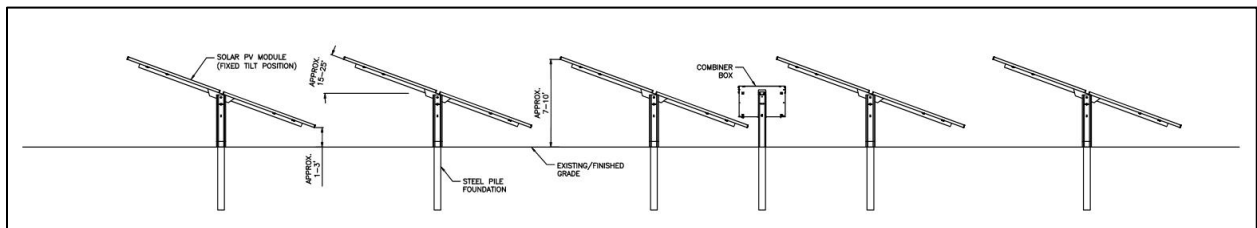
Horizontal Fixed-Tilt Racking Solar PV Typical Elevation View
